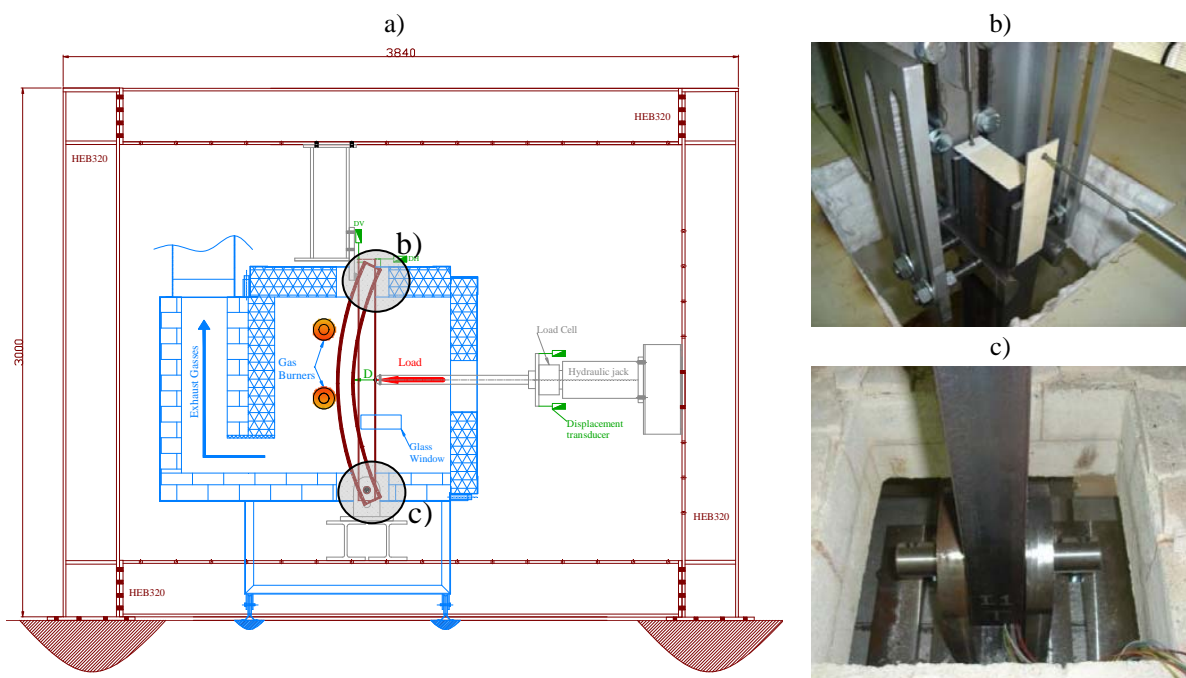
a) Experimental test setup. b) Upper fork support. c) Lower end pinned support.
